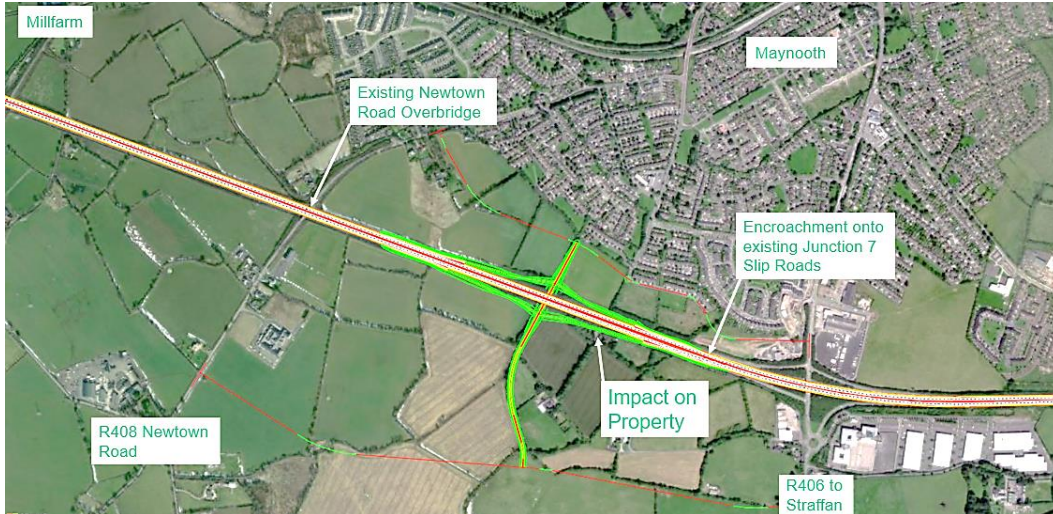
Location C - Junction between Newtown Road and R406 Straffan Road
